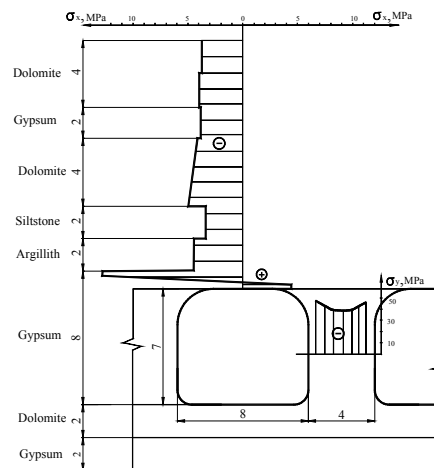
Design Diagram and Stress Epures in Roof and Pillar Rooms.
